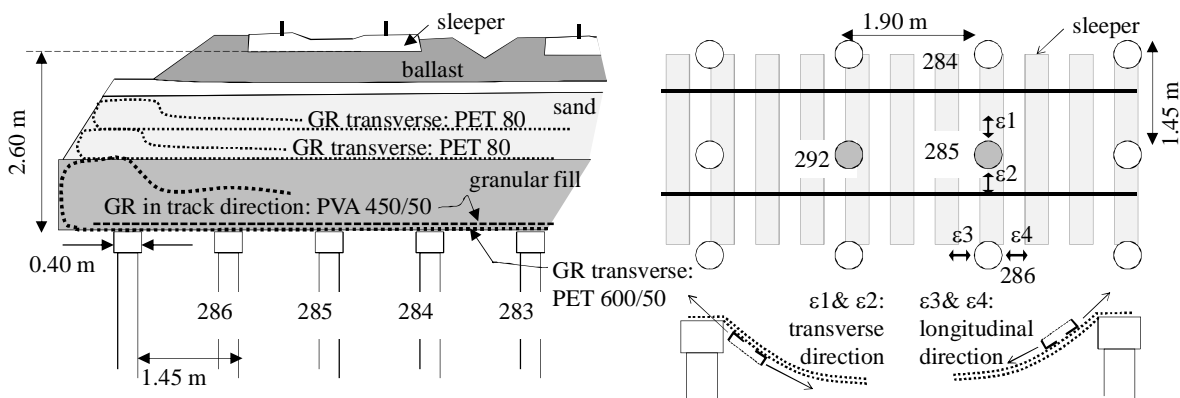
Layout of the part of the monitored site under consideration in Houten, the Netherlands. Drawing modified after Van Duijnen et al. (2010). Detail in bottom right-hand corner: location of strain gauges.
